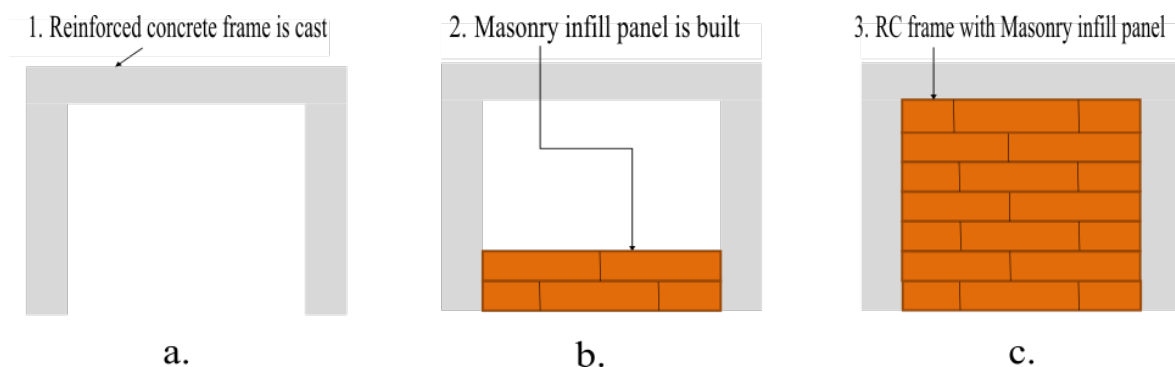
Reinforced concrete frame masonry infill construction sequence [1]
